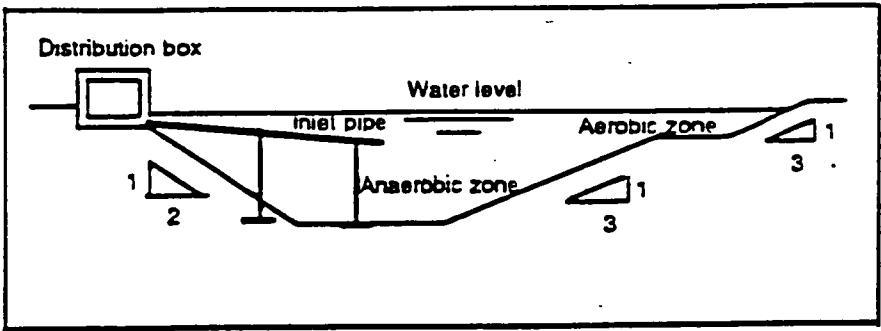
A cross-section dimension of the facultative pond by Mara (1976).
